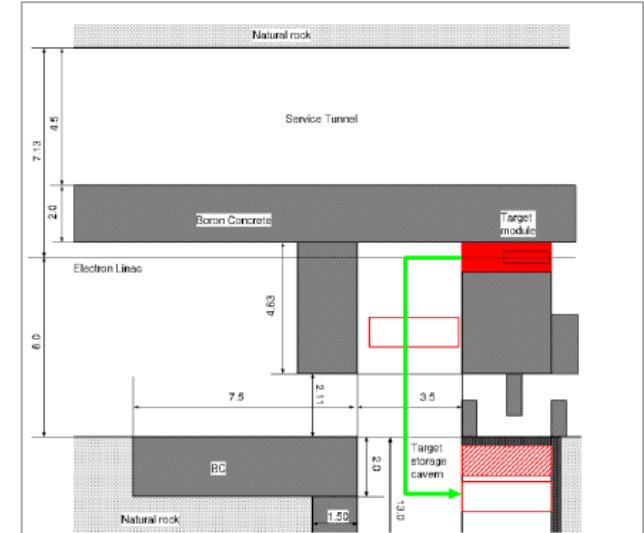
Floor layout of the target section: the central red rectangle is the target module: the shaded gray area is boronized concrete shield: the lower cavern is the target storage area.
